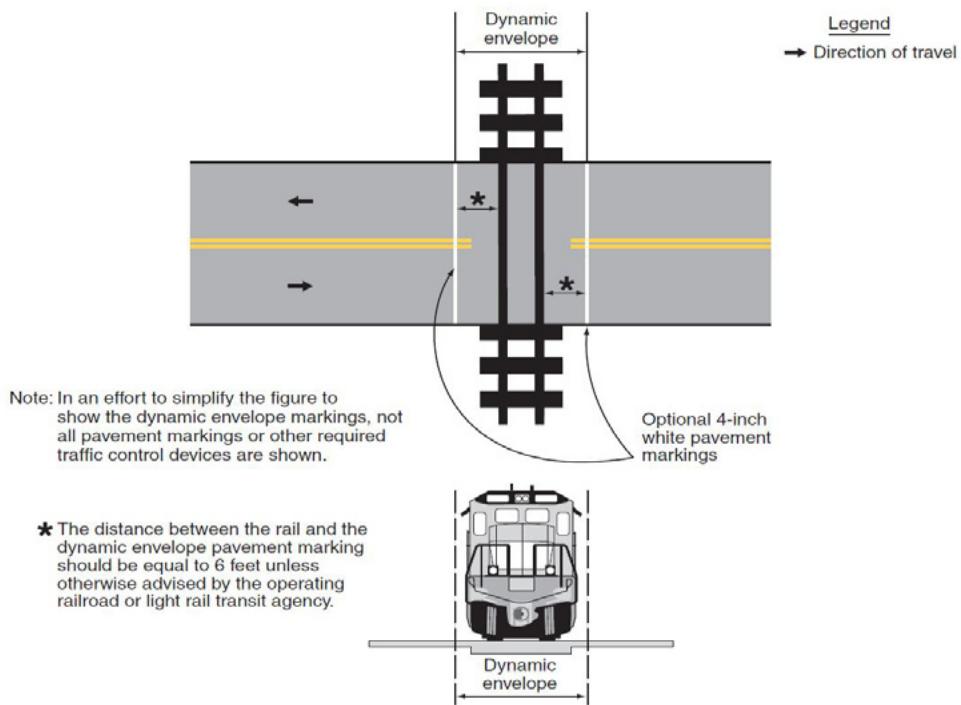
Example of Dynamic Envelopment Pavement Markings at Grade Crossings
